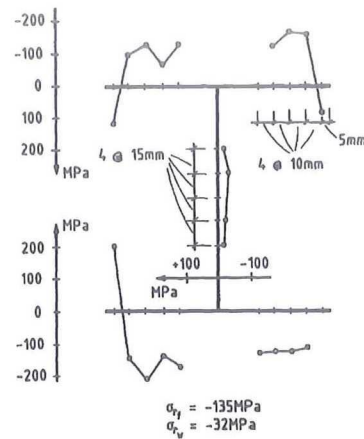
Residual stresses of welded I-section with flame-cut flanges
